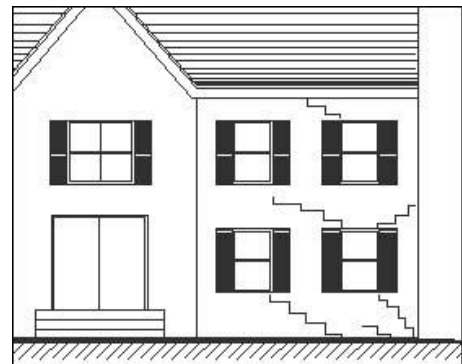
Typical foundation settlement cracks in marine clay
